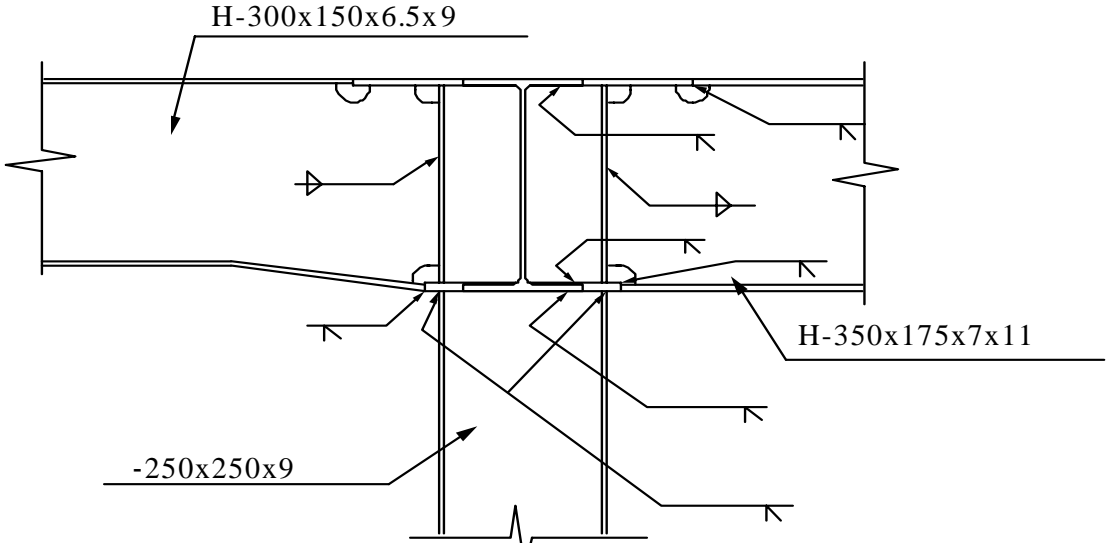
Welded beam-to-column connection extracted from real structure
